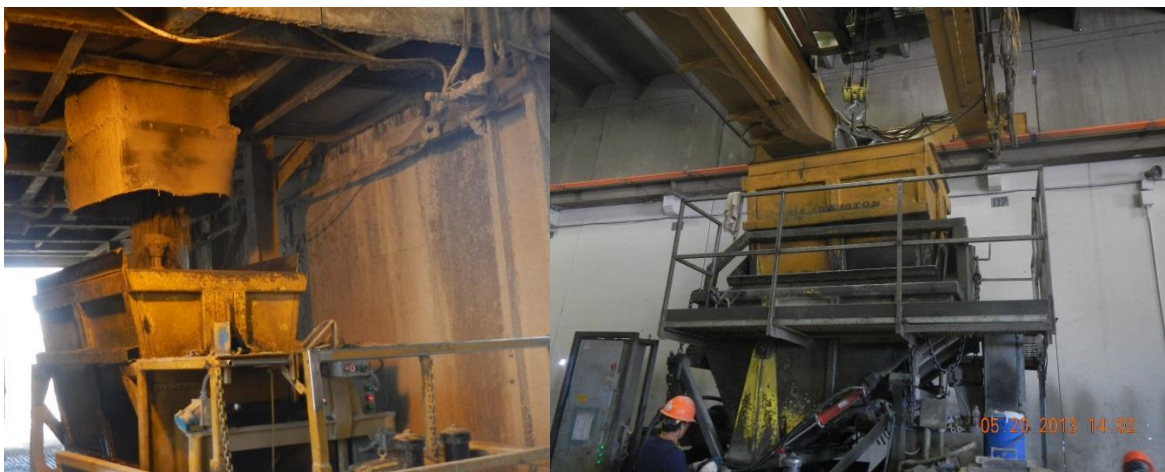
a) Dispensing concrete in the delivery bucket, and b) dropping concrete in the casting machine hopper in Plant A
